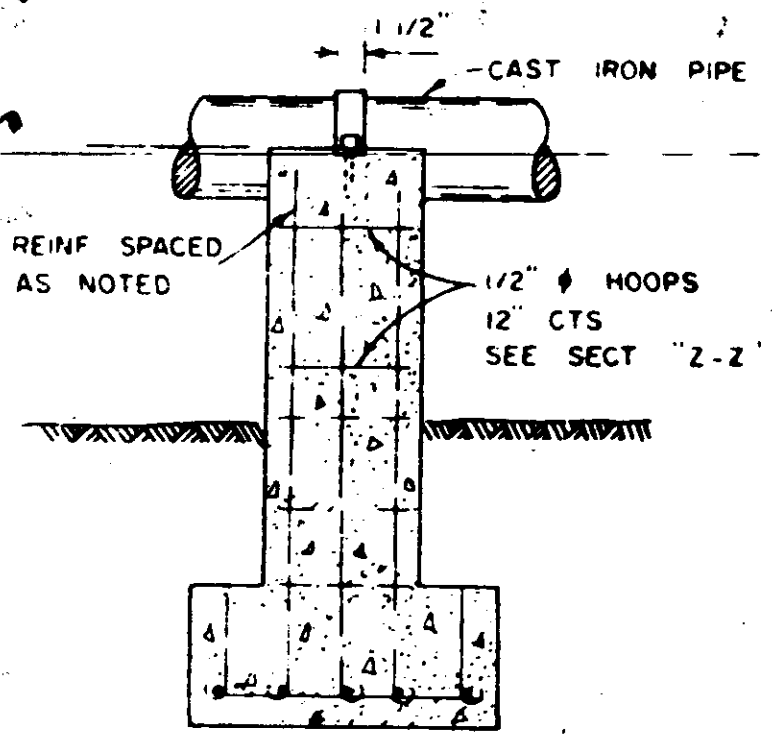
DETAILS OF CONCRETE ANCHOR FOR VERTICAL BENDS
